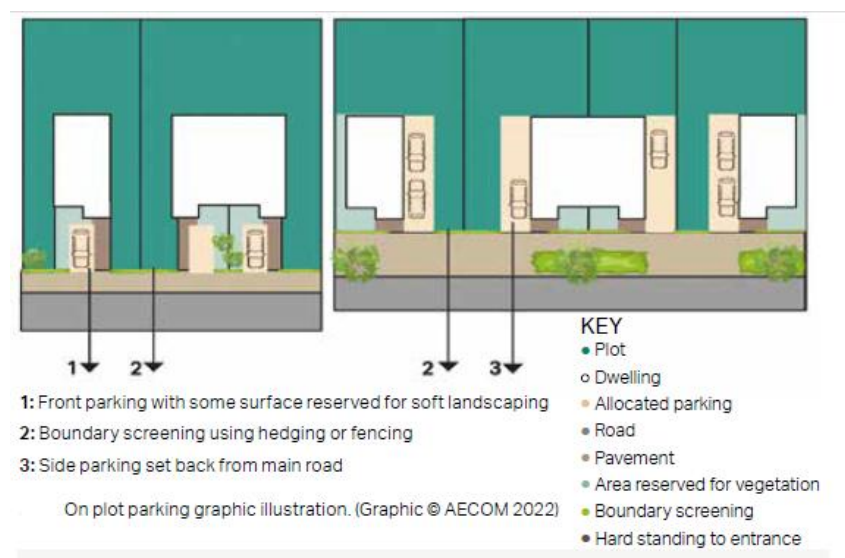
Example of on-site parking graphic illustration (Source AECOM, 2022)
